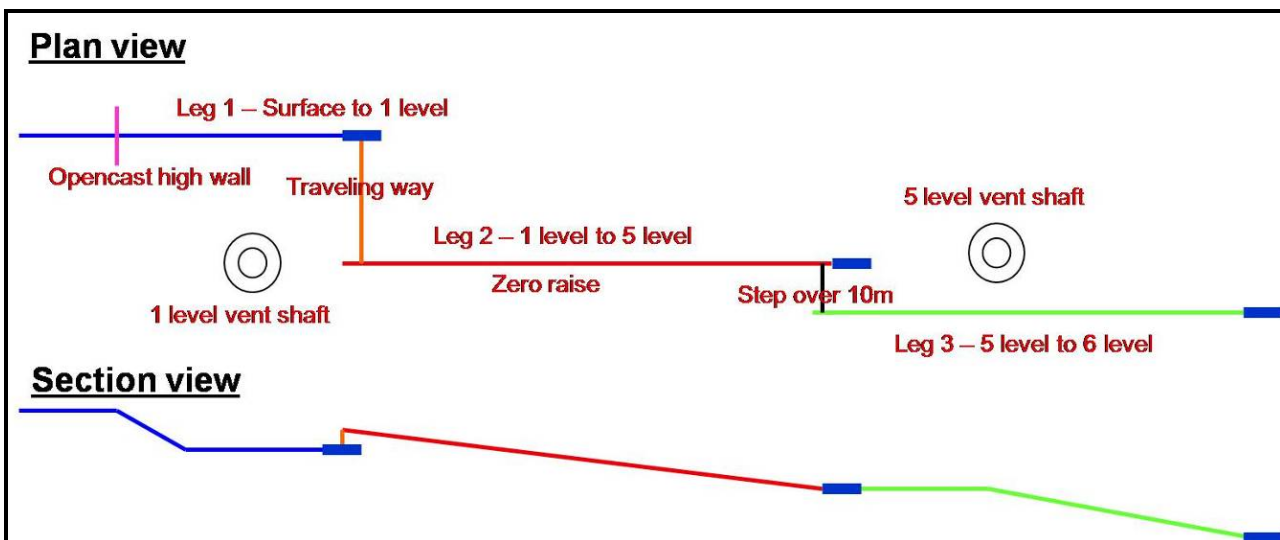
Installation of a Chairlift System in the Zero Raise – in opencast highwall
